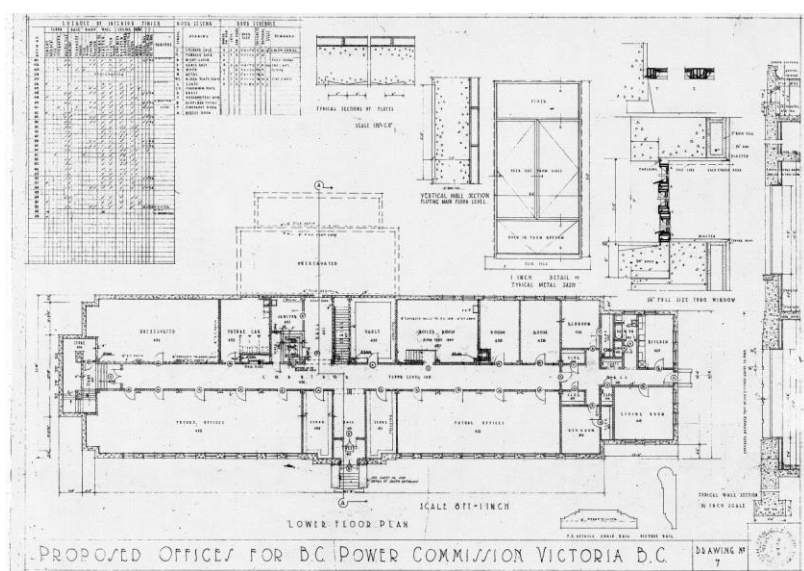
Lower Floor Plan (South Entrance) – Level 1
